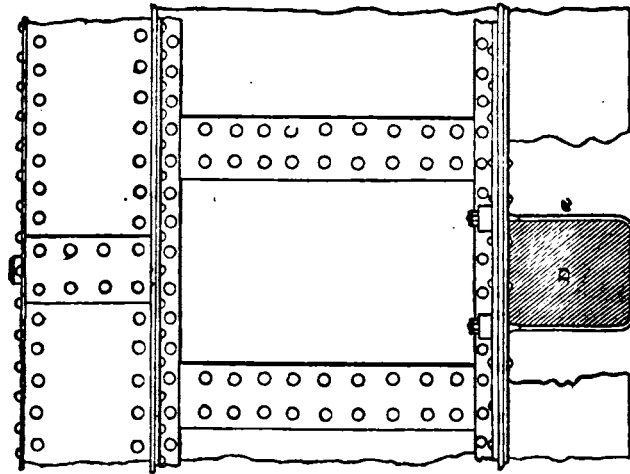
Longitudinal Section of Girder on a raged, with Cross-Beam.
